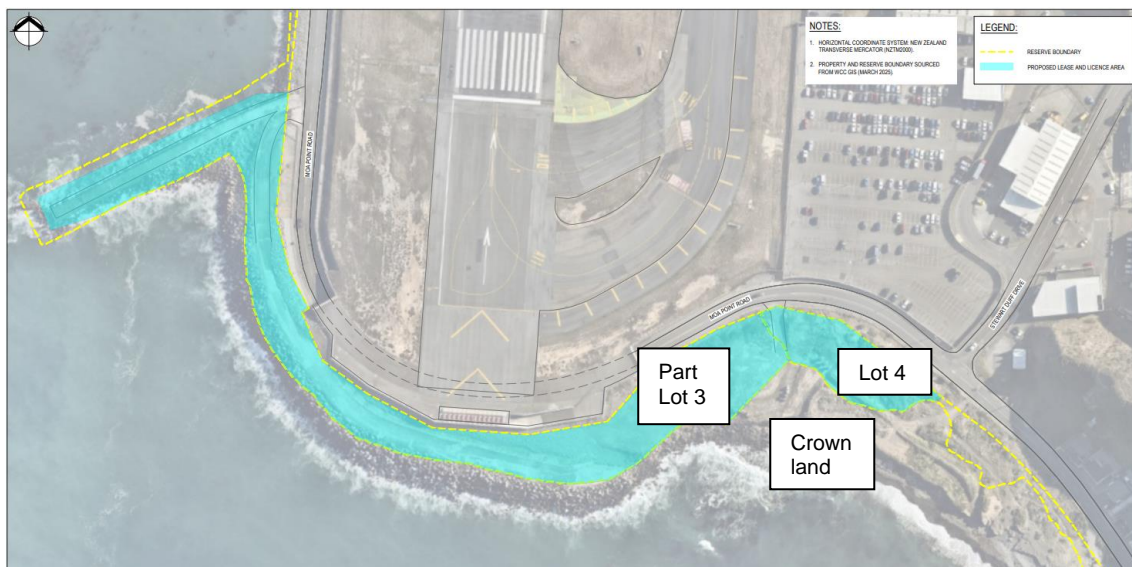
Plan showing reserve boundaries (yellow) and reserve areas (blue) that the Southern Seawall Renewal Project would use during construction, reinstatement and ongoing seawall maintenance.
